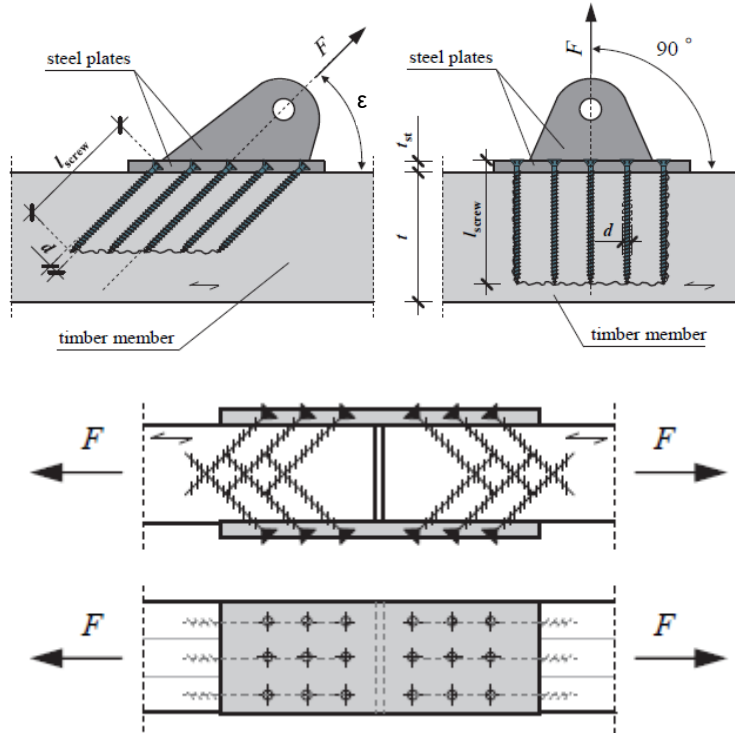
Example of metal-to-timber connection with inclined Schmid screws and Schmid screws arranged perpendicular to the grain
